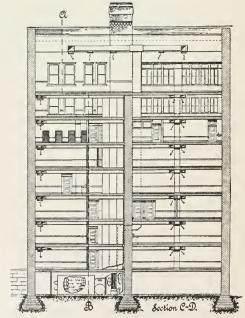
Chicago Telephone Company. Plan of ventilating plant.
